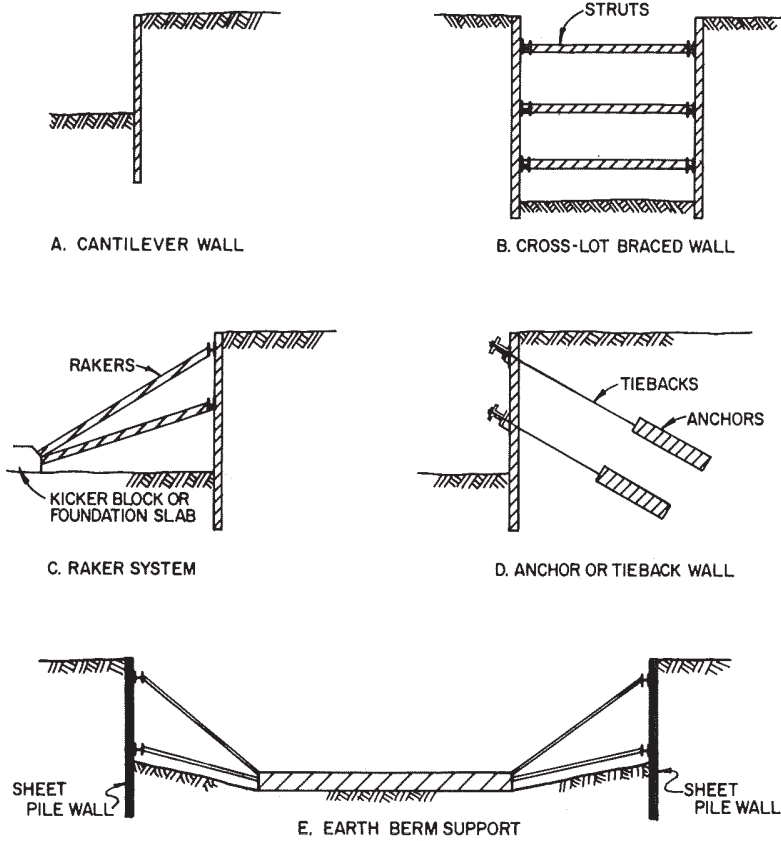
Common excavation support techniques, which can be preferred to the larger excavation footprint of sloped sides. Cantilevered walls and tiebacks provide greater freedom for material storage and crew movement in the excavation than the other methods (NAVFAC, 17).
